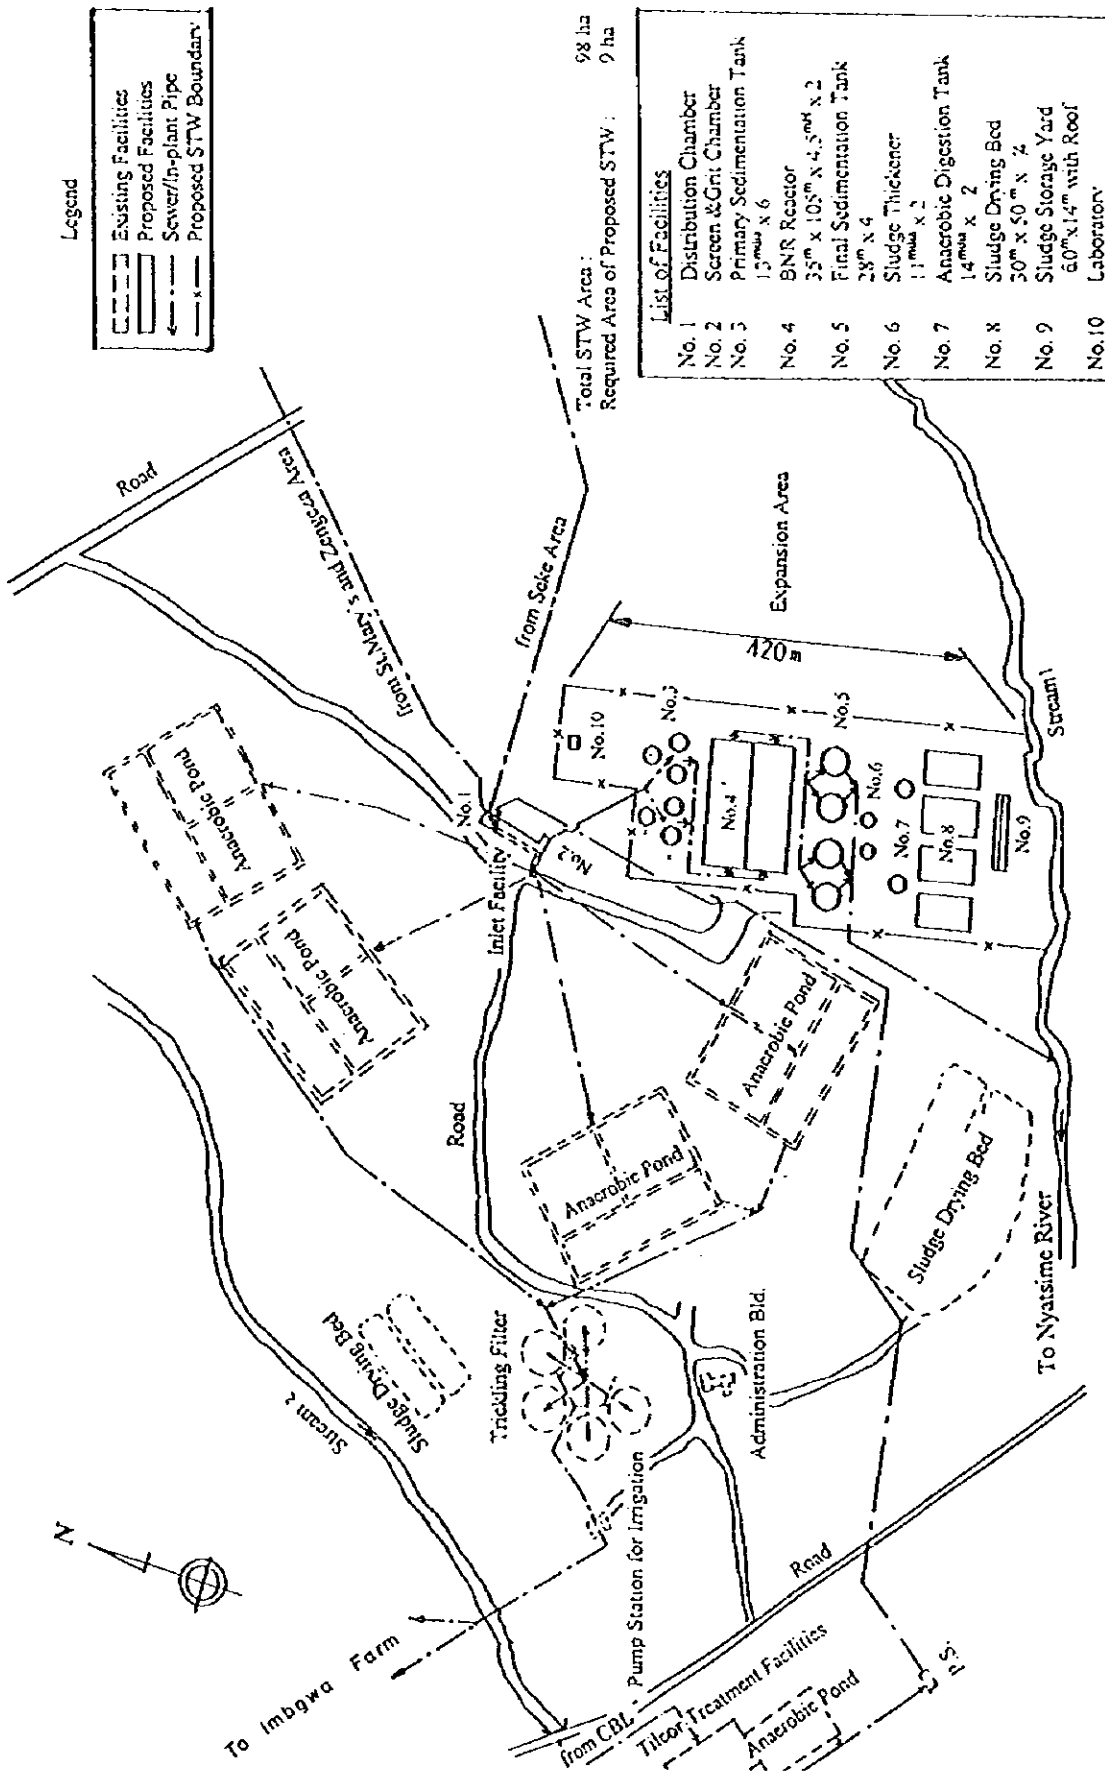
Layout Plan of Proposed Facilities (20,000 m³/day capacity)
